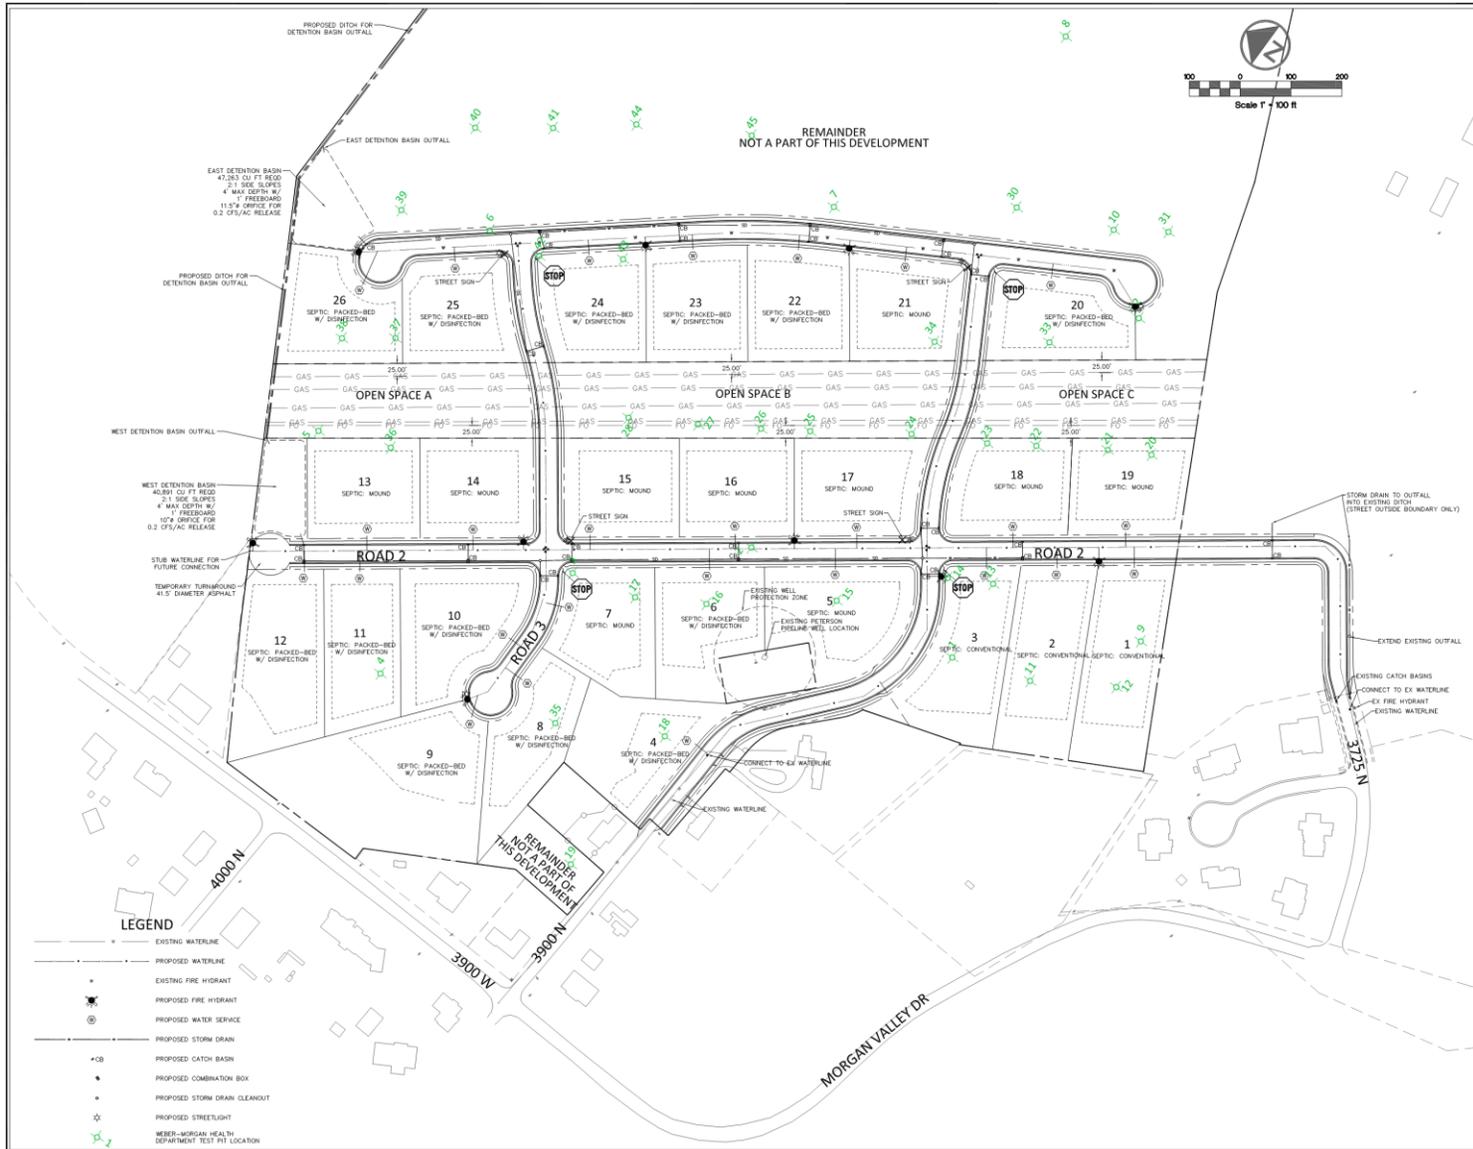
Exhibit F: Proposed Subdivision Preliminary Plat (Drainage and Utility Plan)
